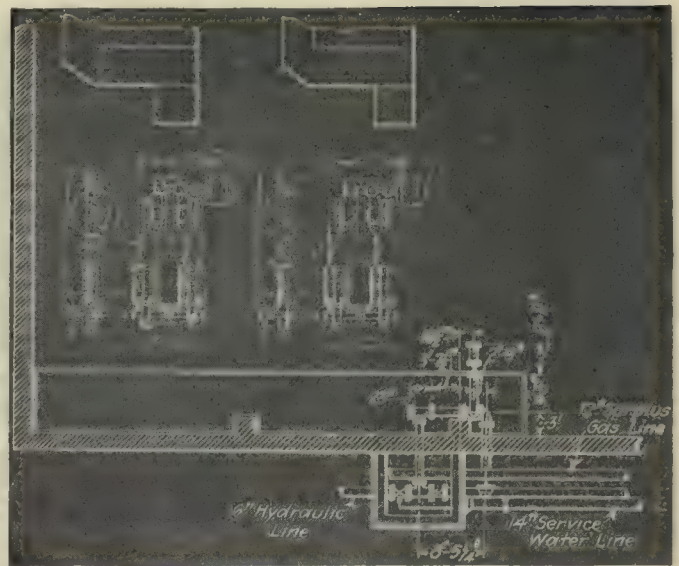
PHOTOSTAT PLAN IN POSITION ON FLOOR
